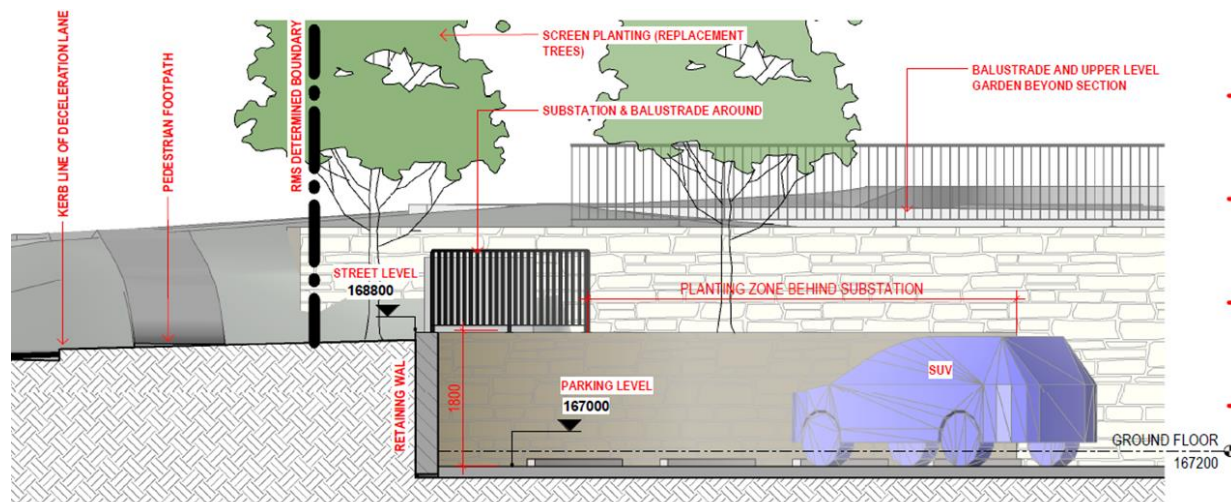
Section through proposed visitor parking spaces (Source: Morrison Design Partnership)
